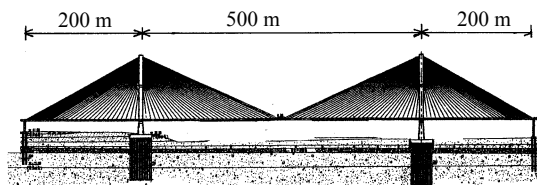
General view of the Jingsha Bridge over the Yangtze River
